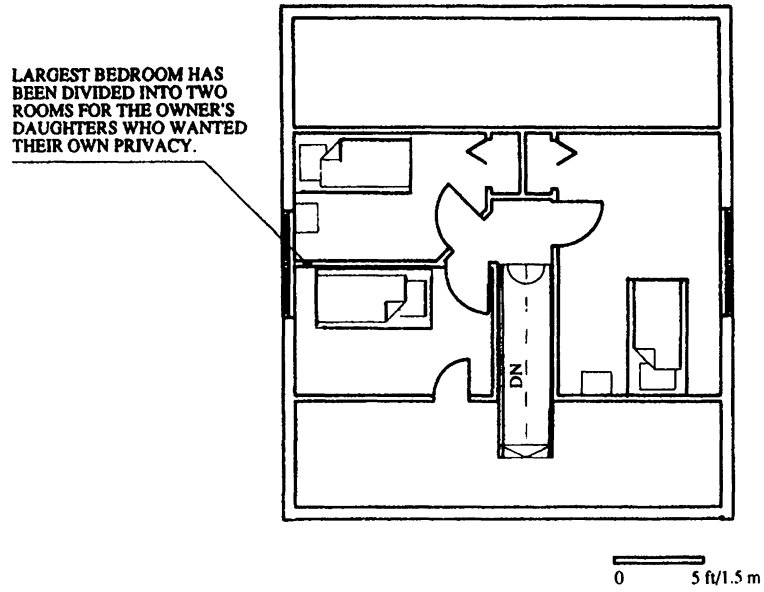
Upper-floor plan of case study 23: Cape Cod attic bedrooms (divided).
